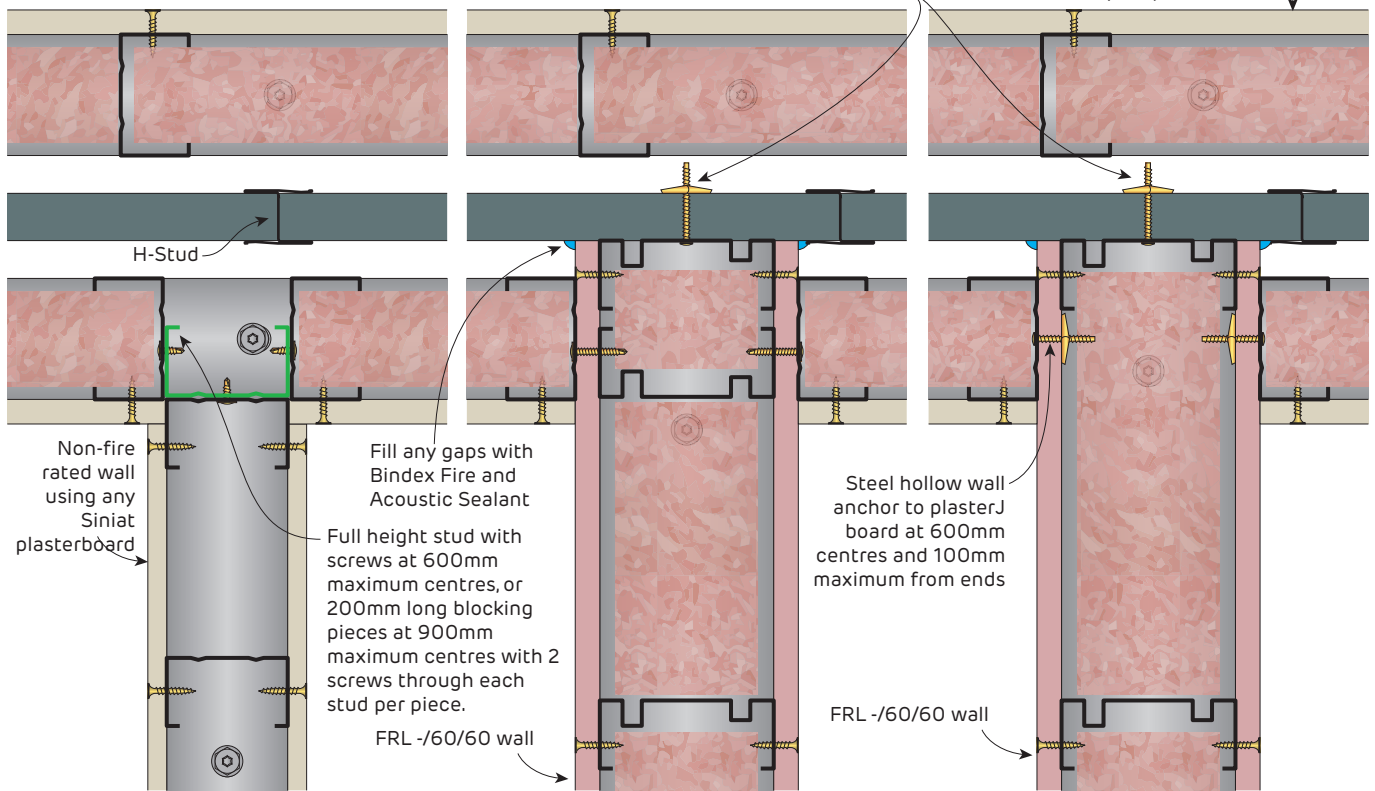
Wall Intersection with Non-Fire Rated Wall Plan
